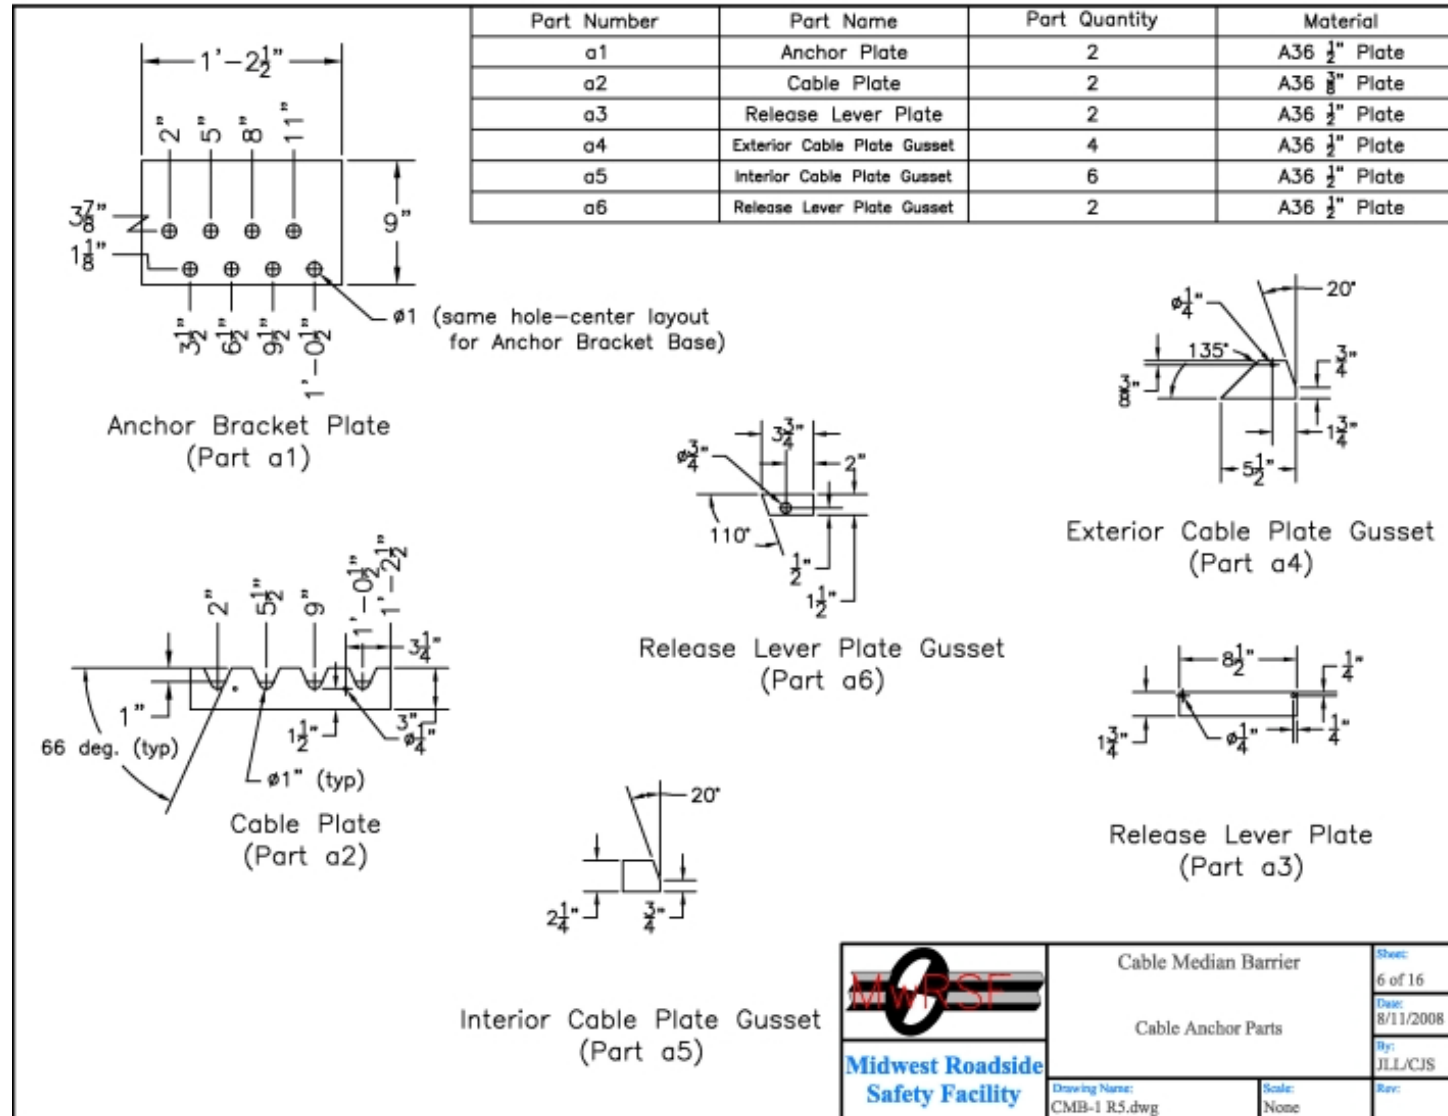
Cable Anchor Bracket Parts (English), Design No. 1
